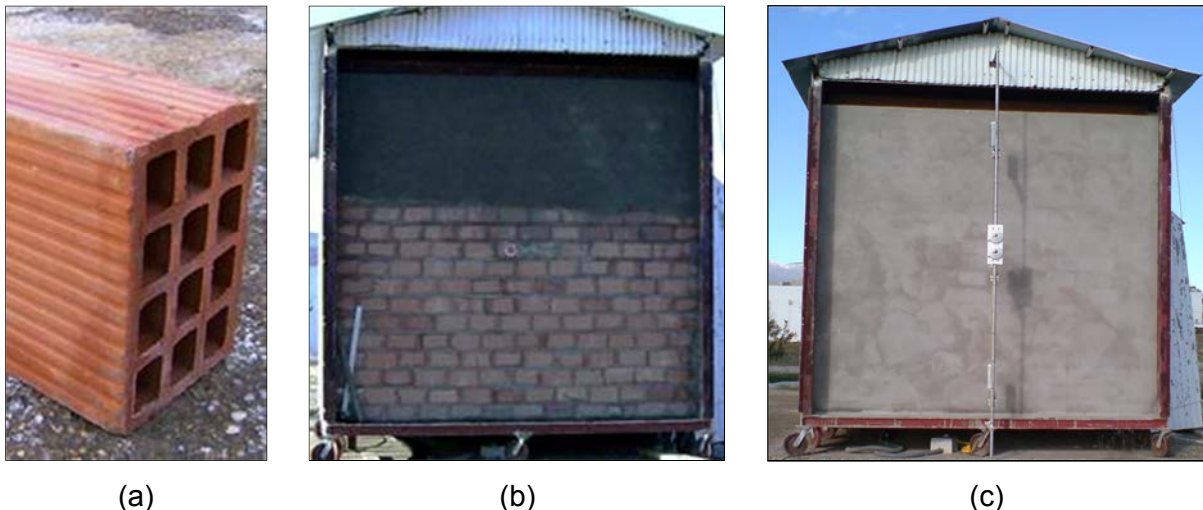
Detail of the construction of the wall. (a) Hollow brick. (b) Cement mortar layering. (c) Wall finally constructed.
